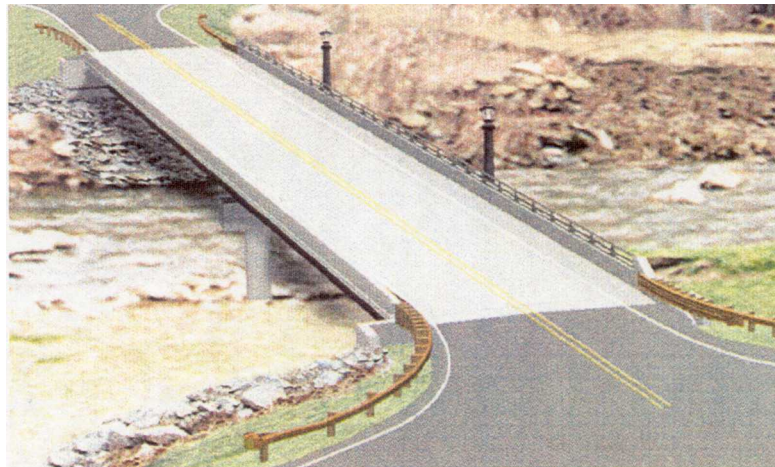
Elevated Rendering of a Proposed Bridge in Chimney Rock, NC. Courtesy of NCDOT Structure Design Unit.
